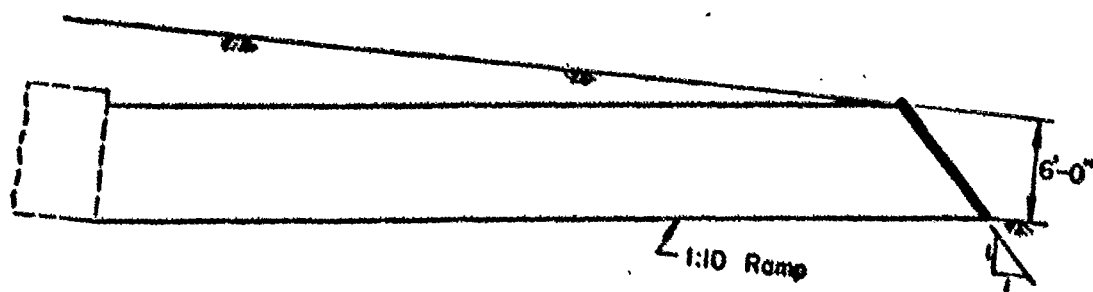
TYPICAL RISER ELEMENTS, CASE 1
